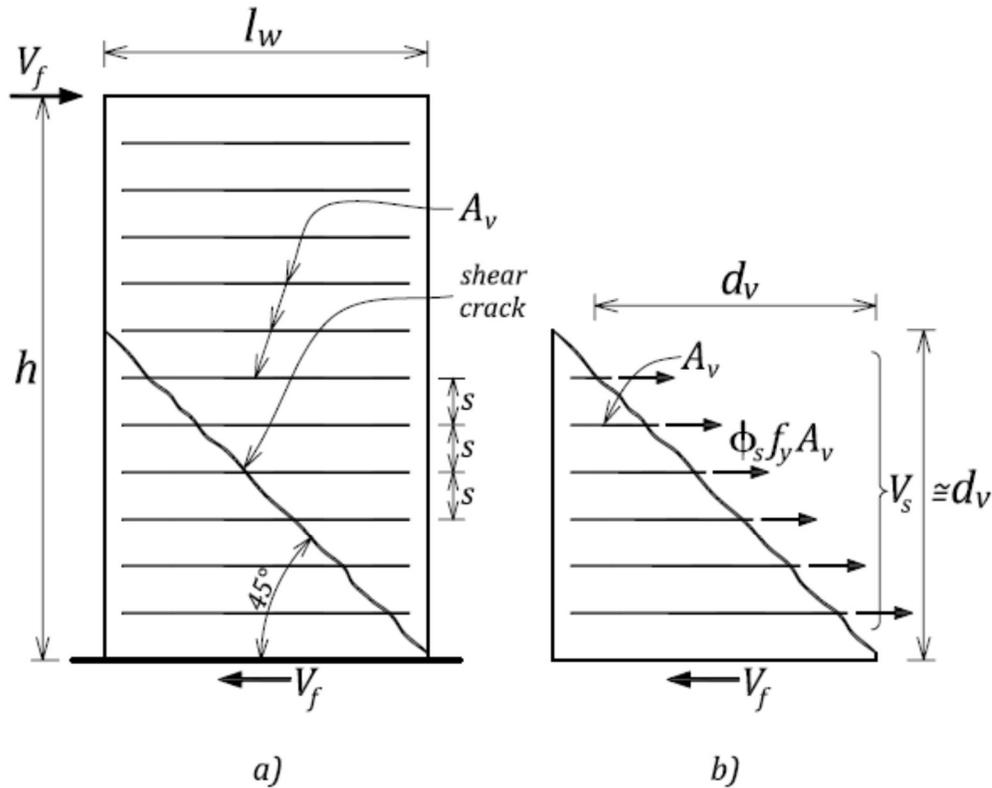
Steel shear resistance in flexural walls: a) wall elevation; b) free-body diagram showing reinforcement crossing a diagonal crack.
